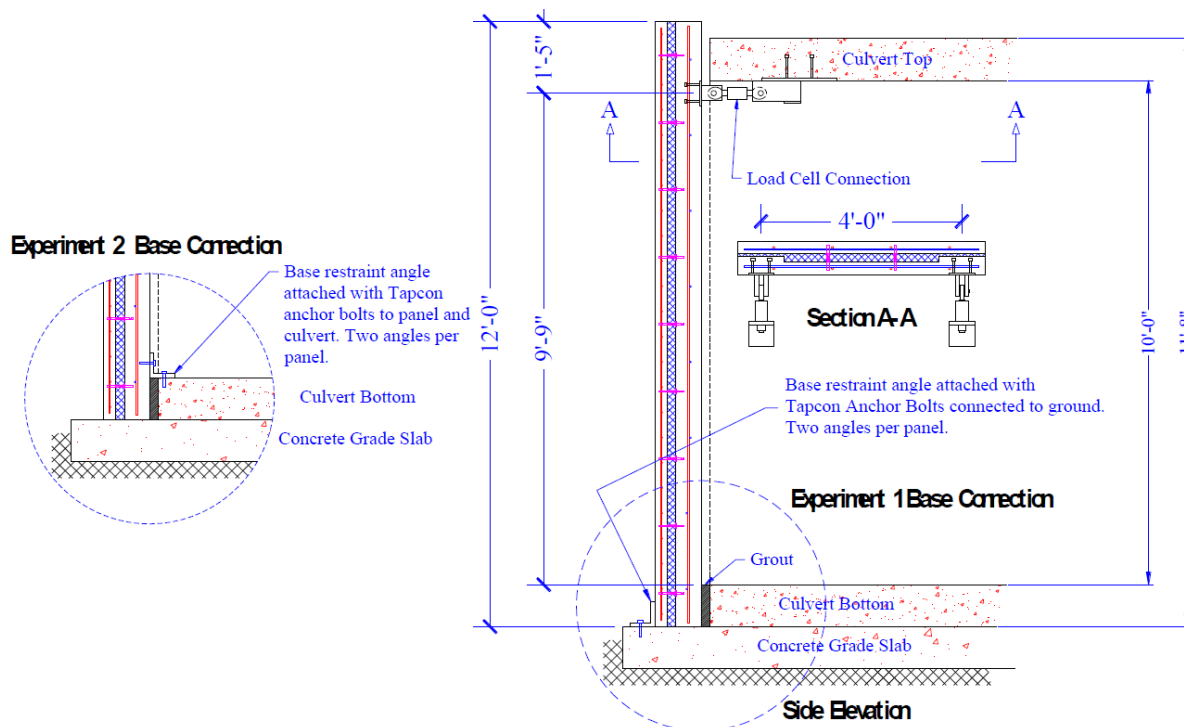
Single-Span Wall Setup (Naito et al. 2011)
